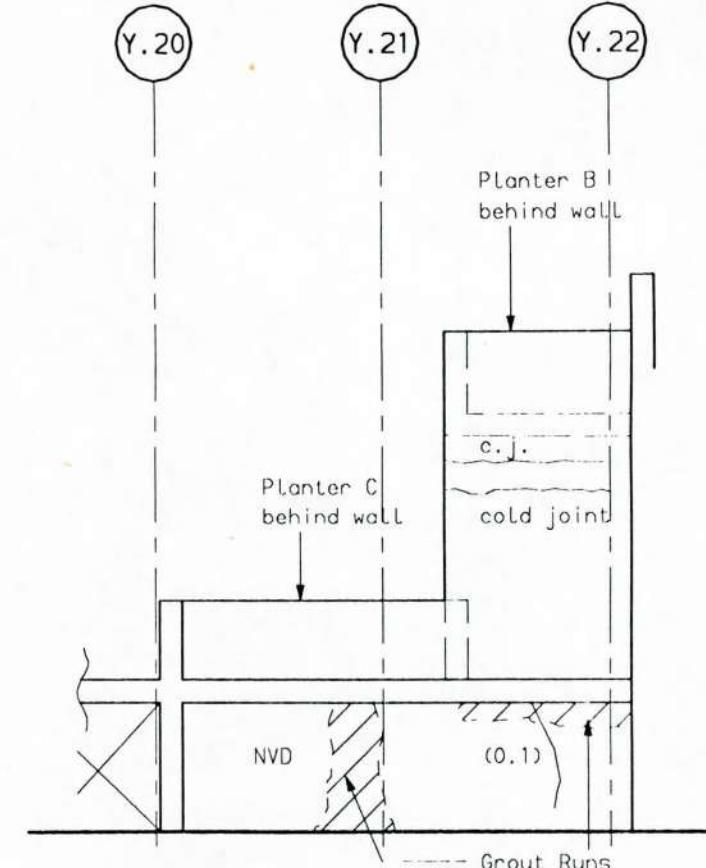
STAIRCASE WALLS D, E & F, INTERNAL ELEVATIONS
